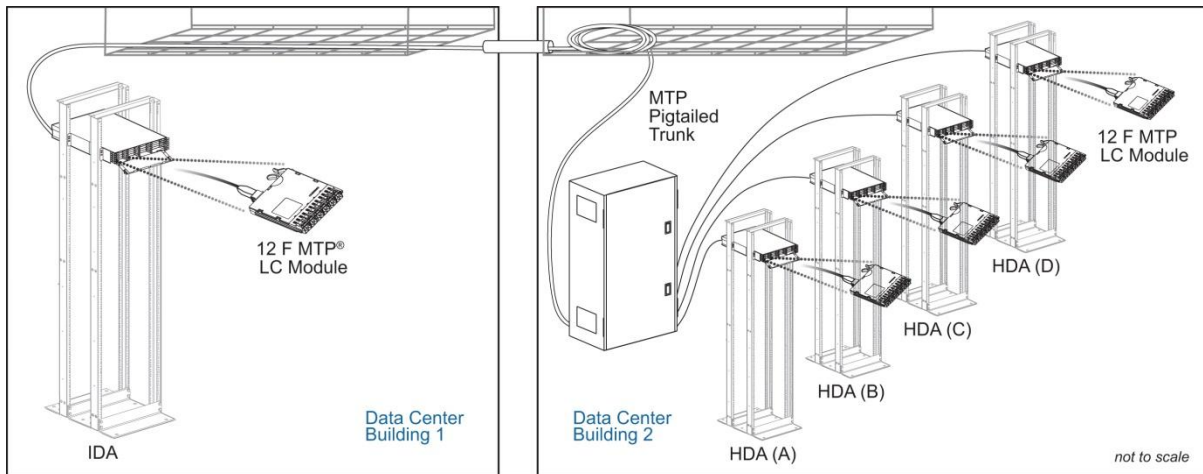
High Fiber Count MTP® Pigtail Trunk Through a Congested Pathway and Spliced to Multiple Lower MTP Pigtail Trunks
